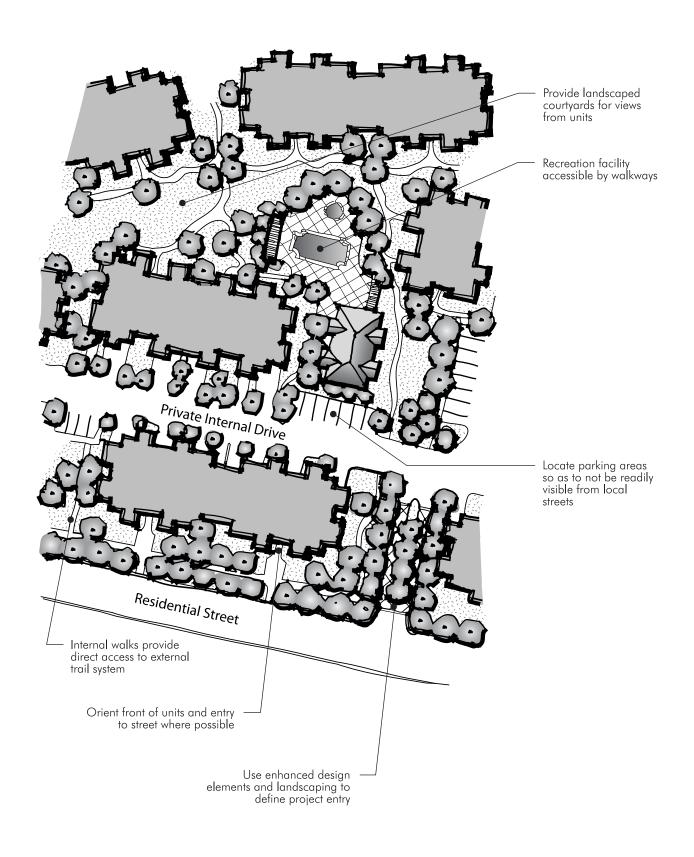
Typical Multi-Family Dwelling Site Layout
